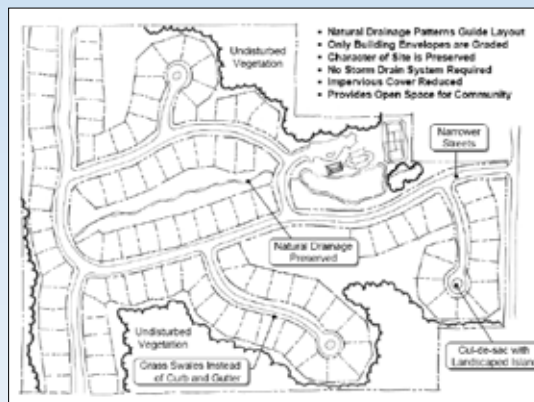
Stormwater Management Concept Plan that Incorporates a Variety of Better Site Planning and Design Techniques
